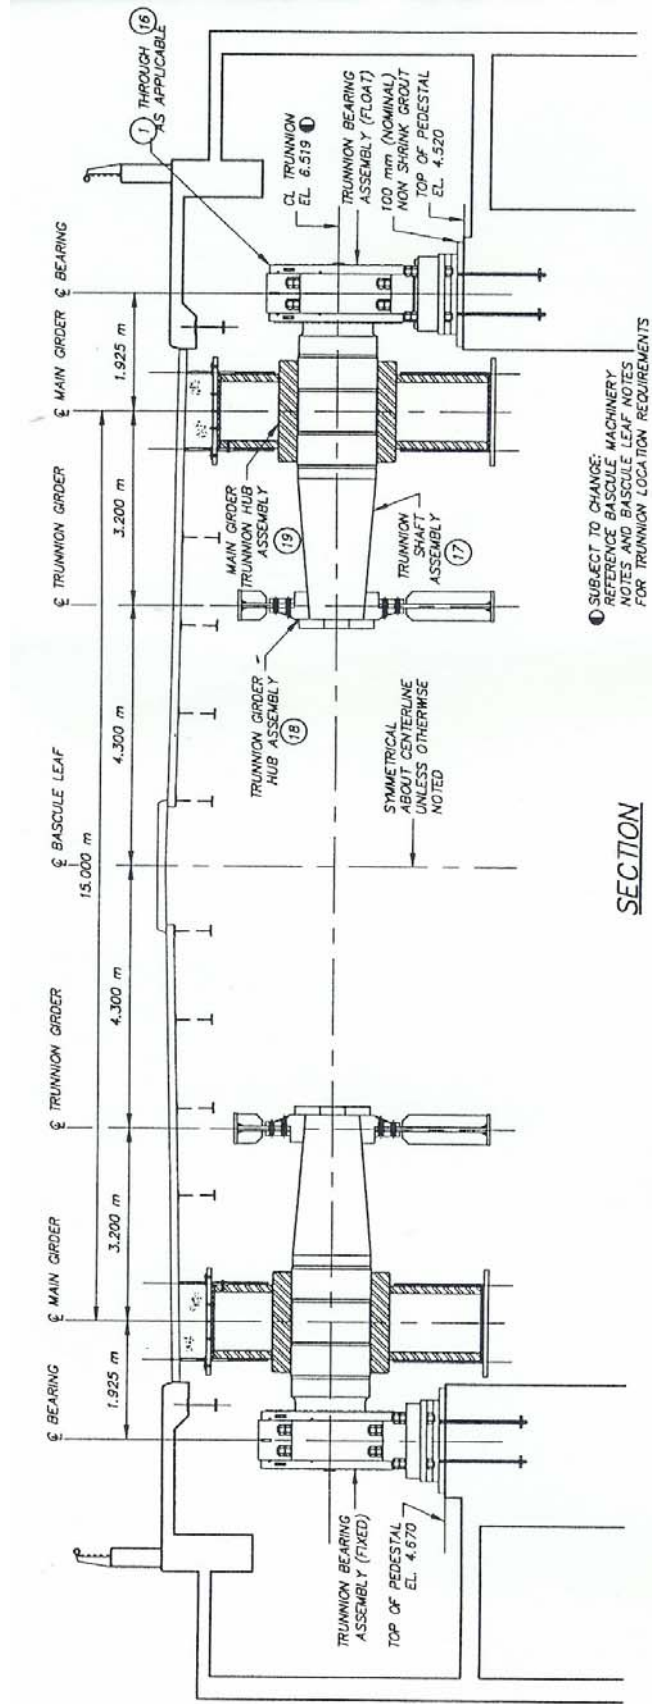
Trunnion-Hub-Girder Assembly Bolt-Pattern 17th Street Causeway Bascule Bridge [5].
